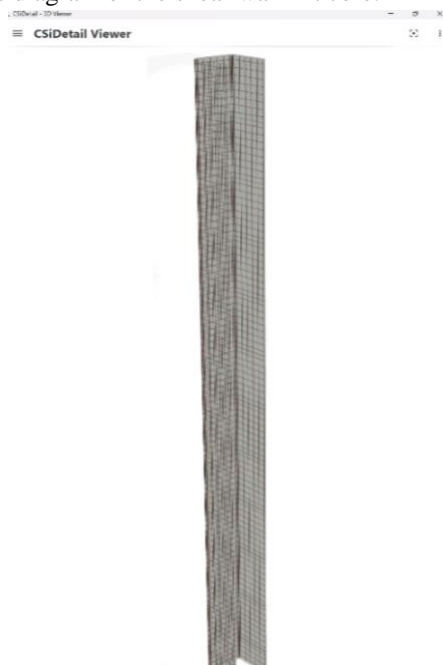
Reinforced Shear wall: Rebar Diagram (Isometric View)
